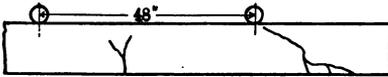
Failure of a Reinforced Concrete Beam.
